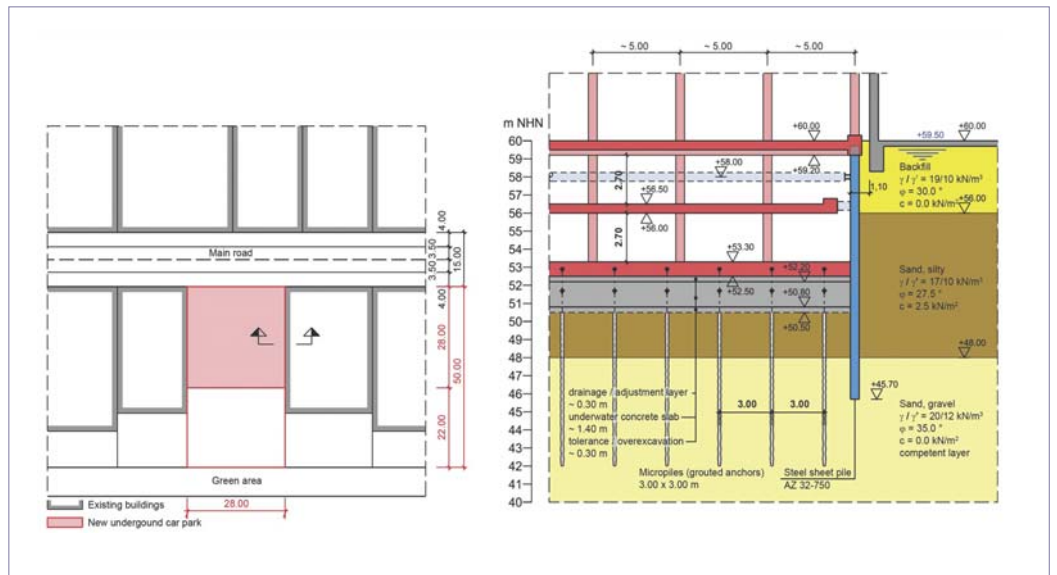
Case study: layout of the UCP and cross section with typical Berlin conditions.
